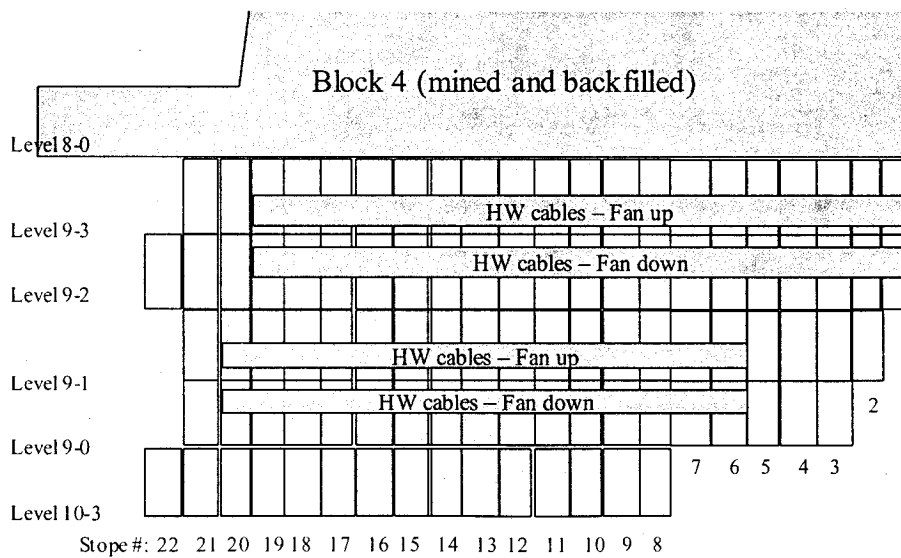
Longitudinal plot showing hanging-wall cablebolt coverage, Block 5
